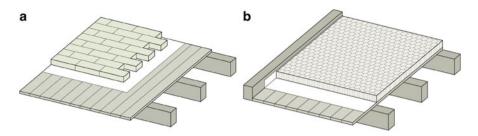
"Overlay" ceiling using earth building material overlays [52]. (a) Earth blocks. (b) Earthen loose fill with honeycomb flooring material to prevent material shift
